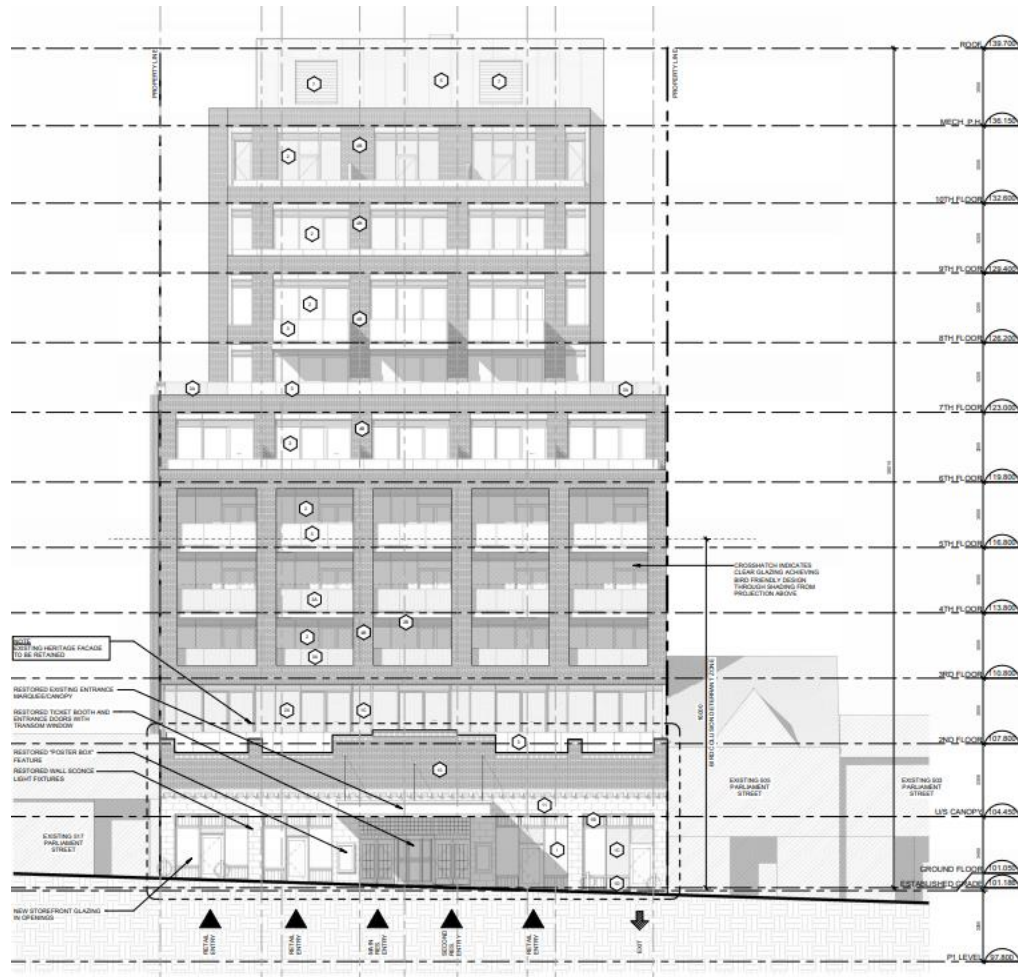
Proposed principal (west) elevation of 509 Parliament Street (RAW Architects Inc., 2025).
